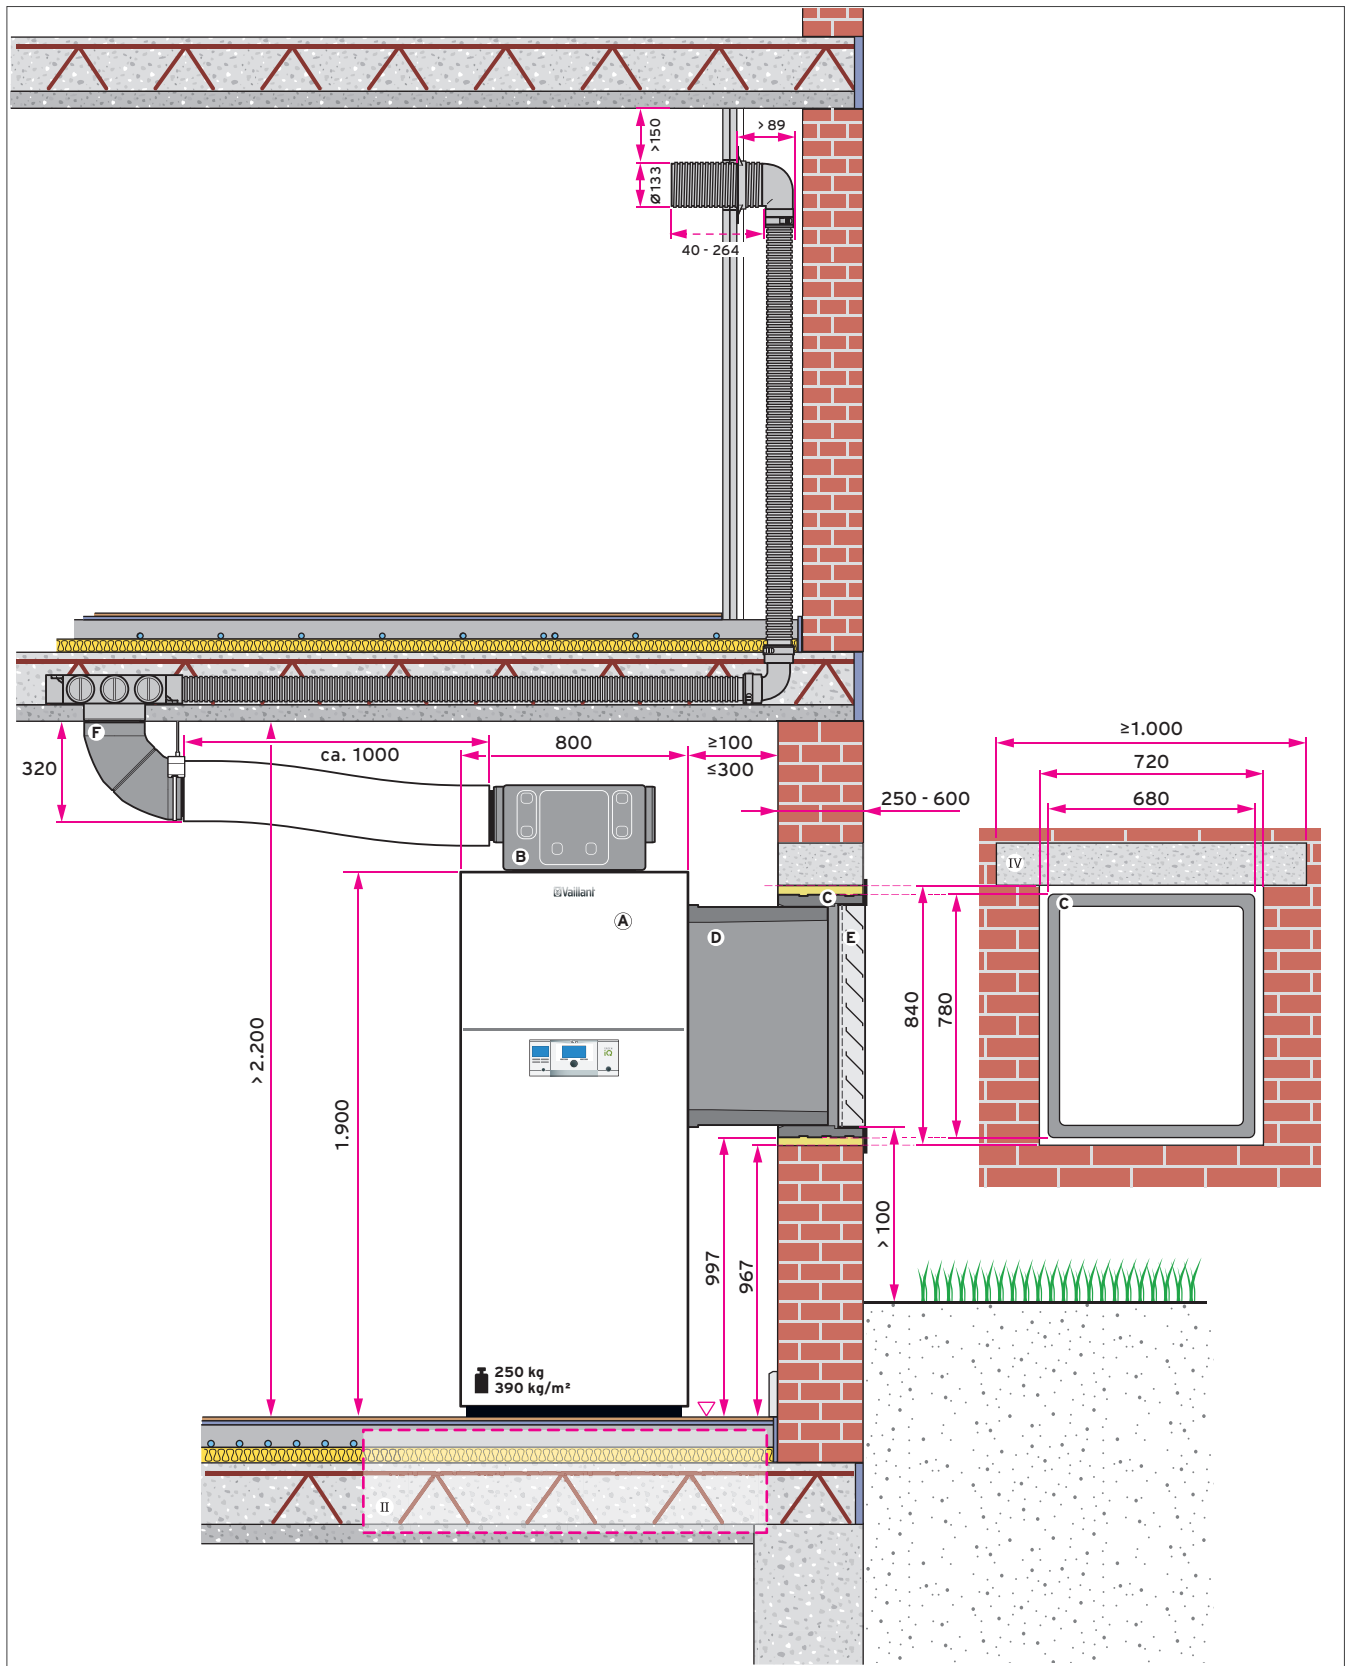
versoTHERM with versoVAIR installation situation, ground floor - corner installation
